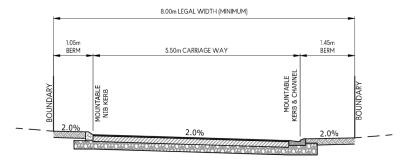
Typical JOAL Cross-Section (1) - 8.0m Minimum with Berms
